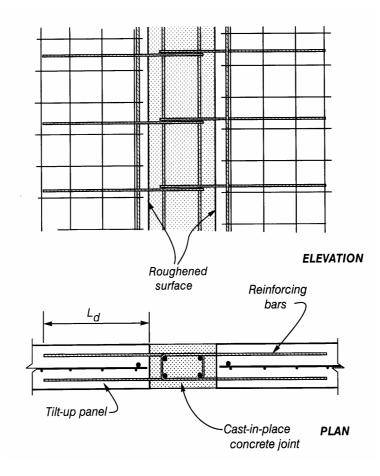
Vertical connection detail between walls: Connection with overlapping hoops
